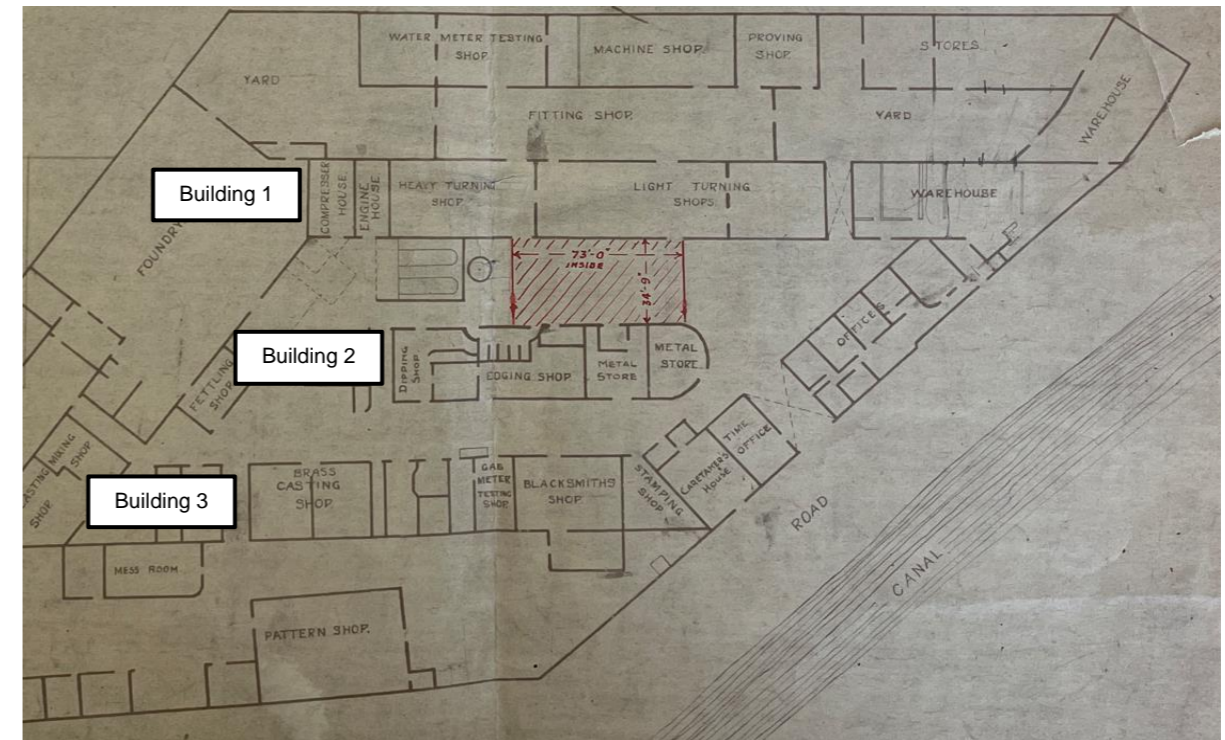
Undated ground floor plan but assumed to be c.1930 as proposed new structure between Buildings 1 and 2 as illustrated on 1934 OS Map is shown in red. Indicated uses at ground floor as follows: Building 1 - compressor house, engine house, heavy turning shed, light turning shops, gap for alley, warehouse, Building 2 - Dipping shop, edging shop, metal store x 2 (iron turning workshop added between Buildings 1 and 2), Building 3 - Brass casting shop, gas meter testing shop, blacksmiths shop, stamping shop.
